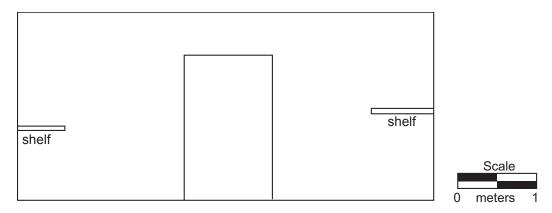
Elevation of northeast interior side of stone structure at Rancho El Saladito.
